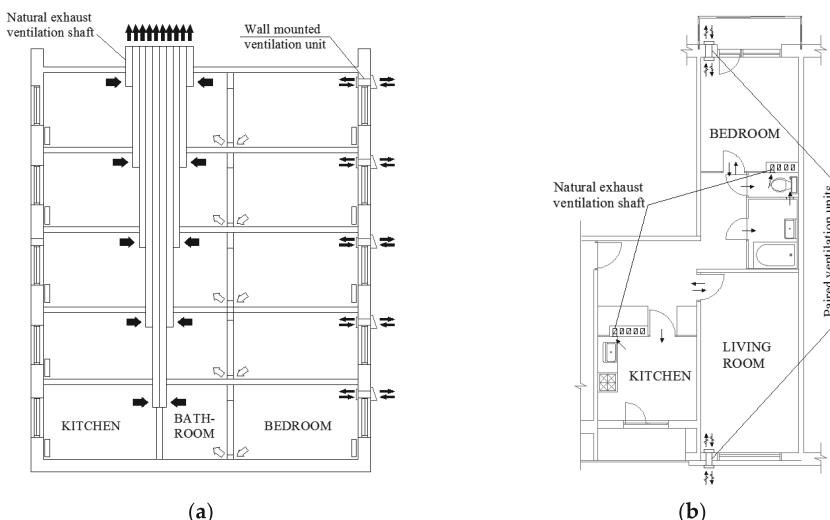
Principle solution of the ventilation system with room-based units: (a) cross-section and (b) floor plan of a typical apartment.
